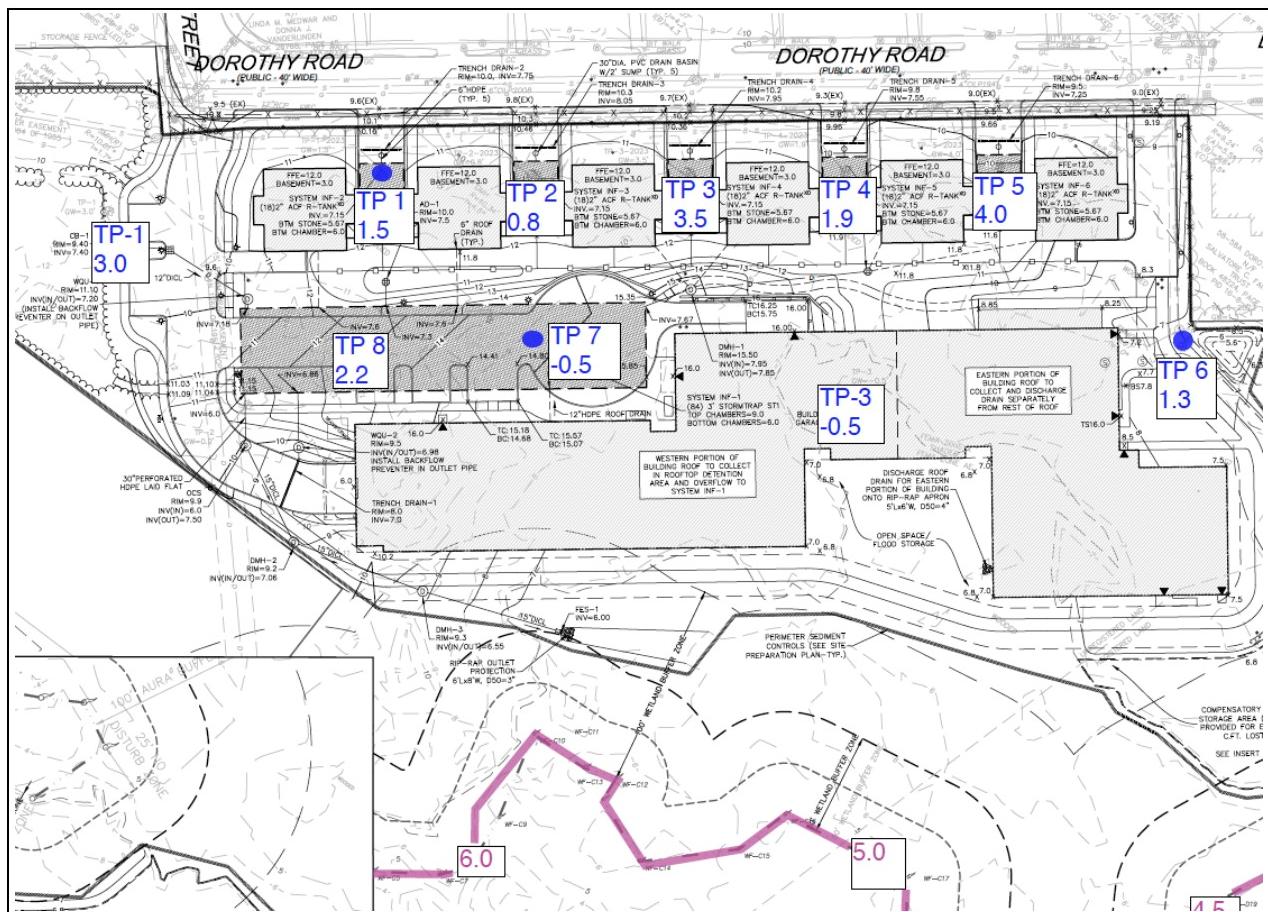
Site Plan Hydrology (Groundwater Levels -Blue, Wetlands Elevations - Green)
